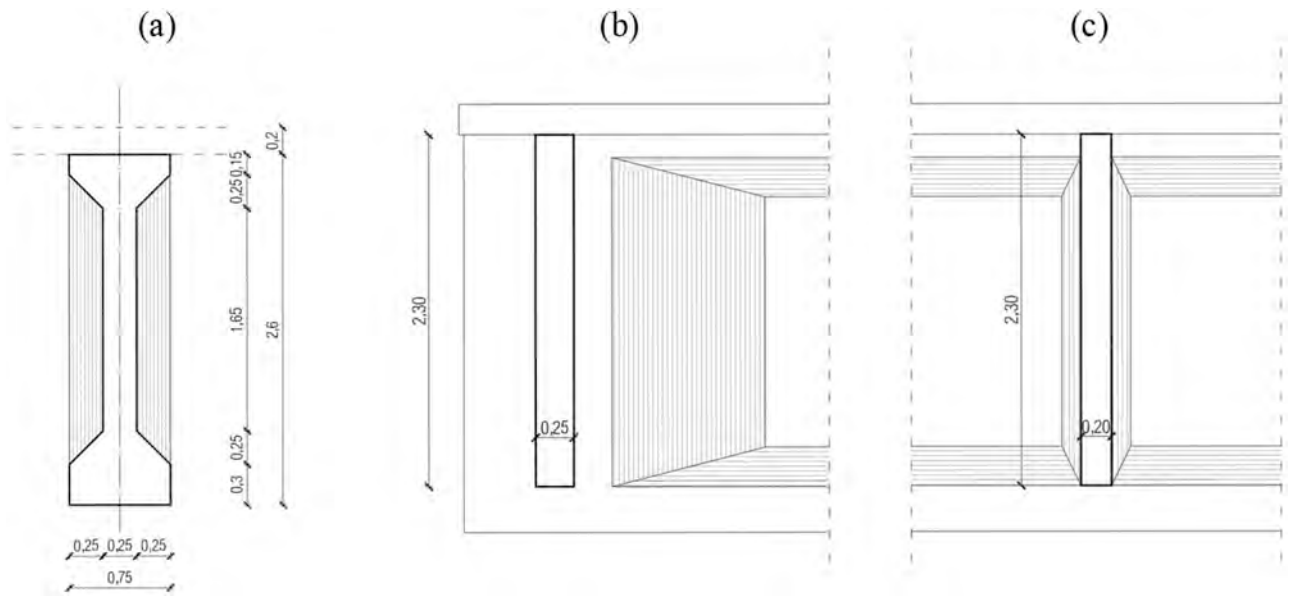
Geometrical details: (a) longitudinal beam cross-section, (b) transverse beams at the ends of the spans, (c) span transverse beams. Measurements are in meters.
